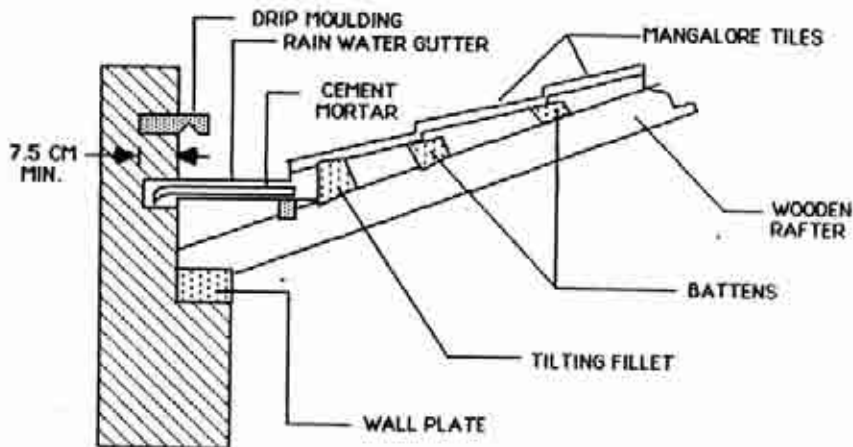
DETAIL AT THE JUNCTION OF THE ROOF WITH WALL
